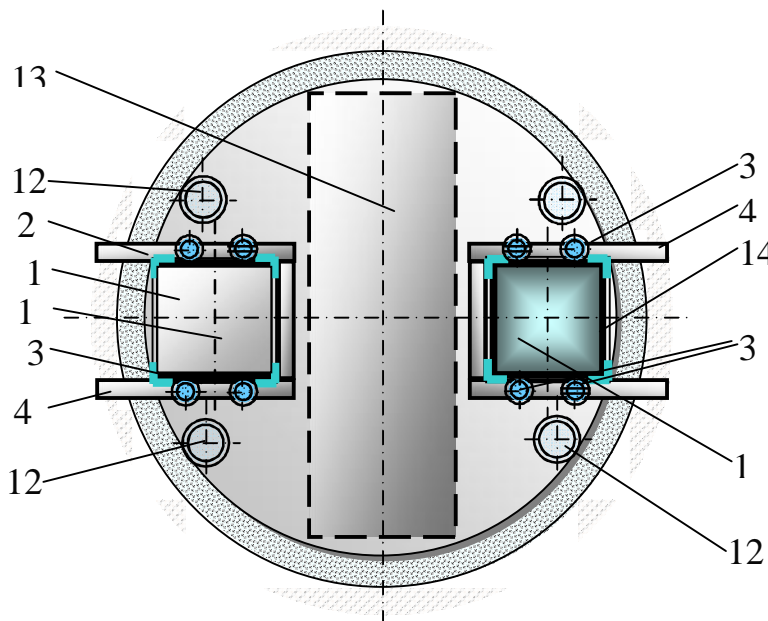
Variant of equipment arrangement of shaft by hydrojack hoisting HJHD
